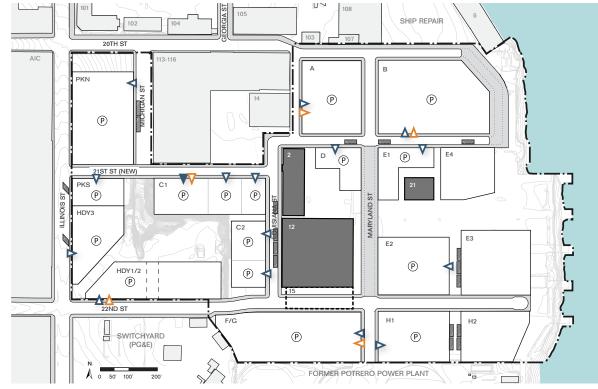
Illustrative Plan of Loading and Parking Access
